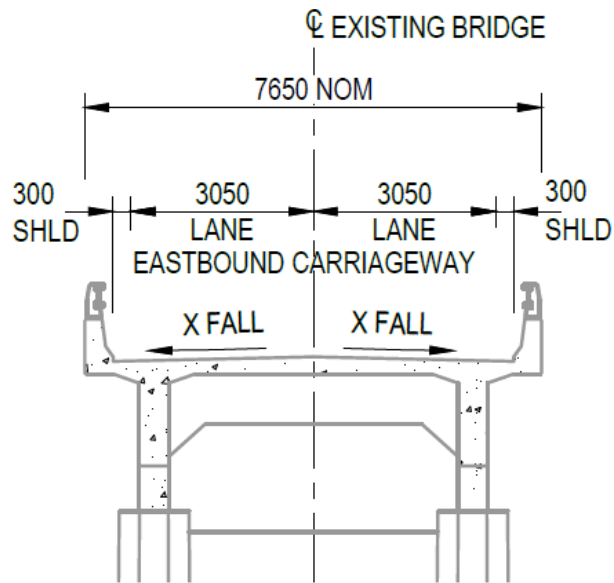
Typical cross section of existing Heathcote Road bridge structure
